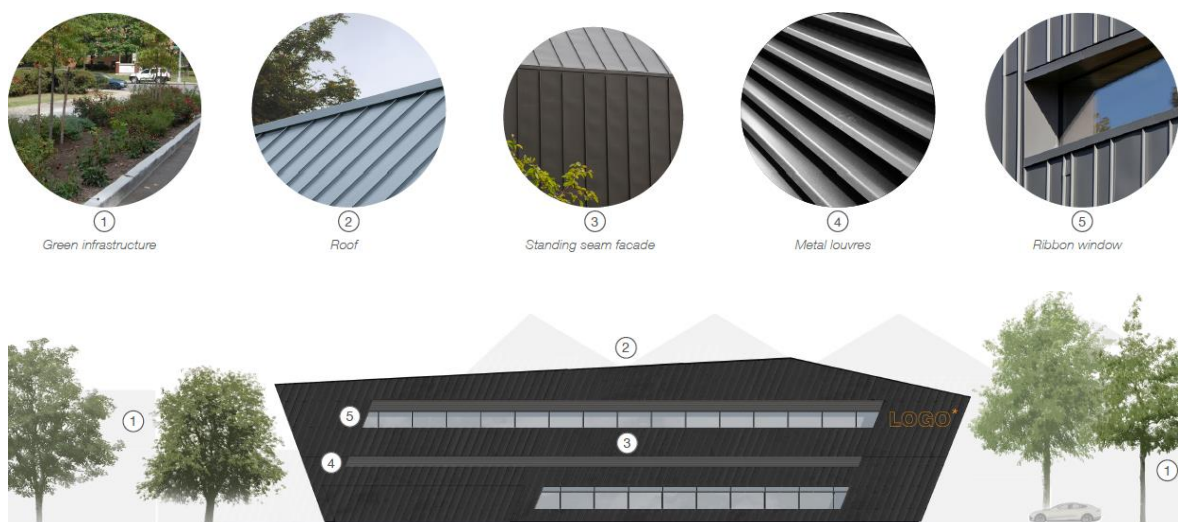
Extract from the DAS showing the side elevation with the proposed materials palette.
